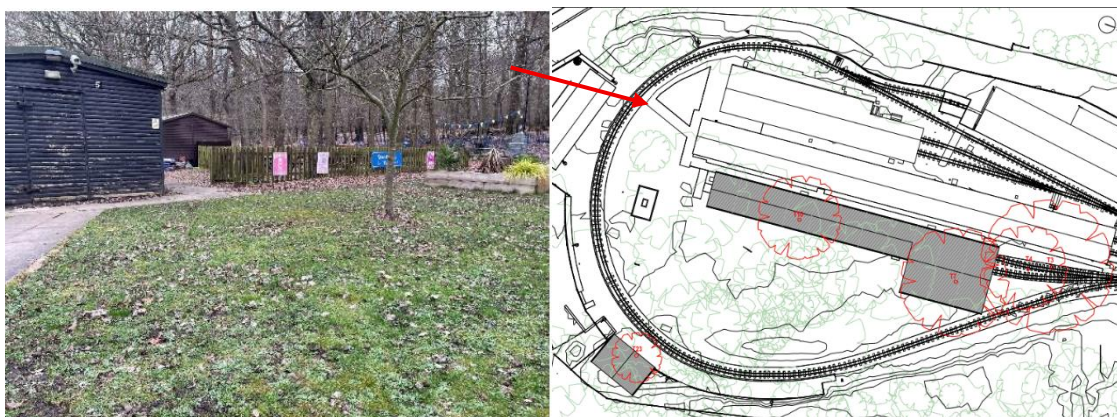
Photo of existing site and Proposed Plan (right). Arrow denotes approximate location and direction of photograph.
